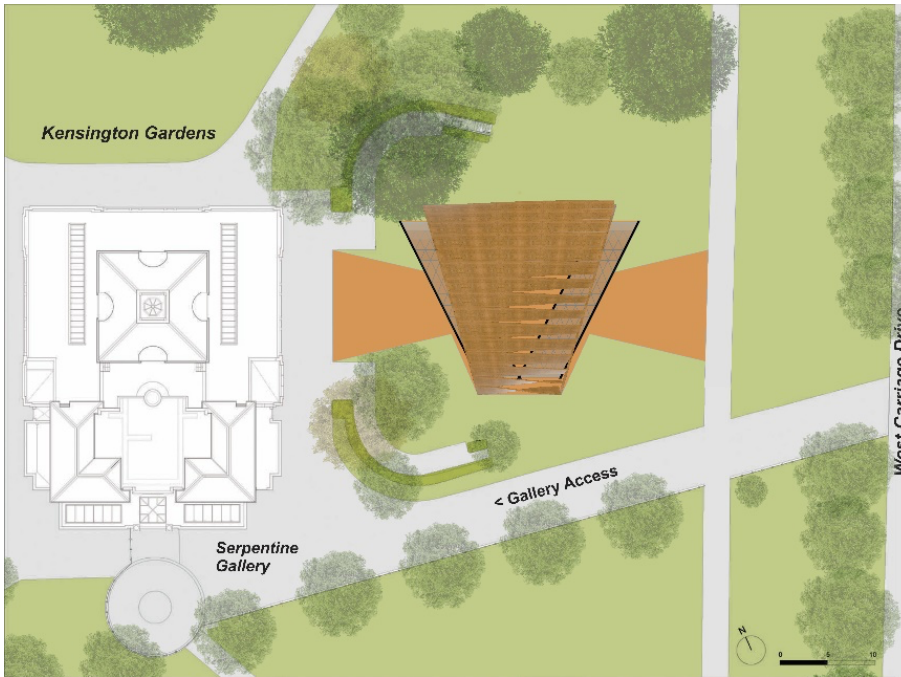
Site plan of Sartorius Pavilion in the gallery garden.
